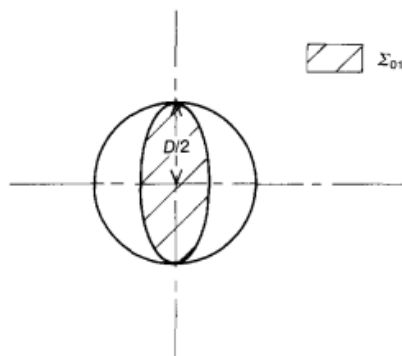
Area of tunnel face at failure (Leca and Dormieux, 1990)
